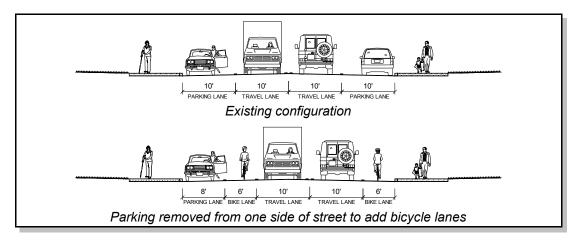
Where onstreet parking demand is light, it may be possible to eliminate parking on one or both sides of the street.
